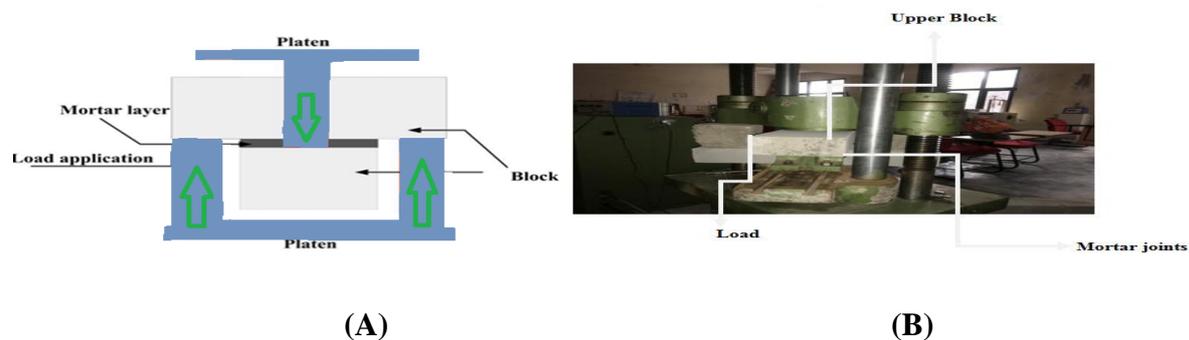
(A) Experimental setup Image (B) A view of the triplet test setup from the front.
